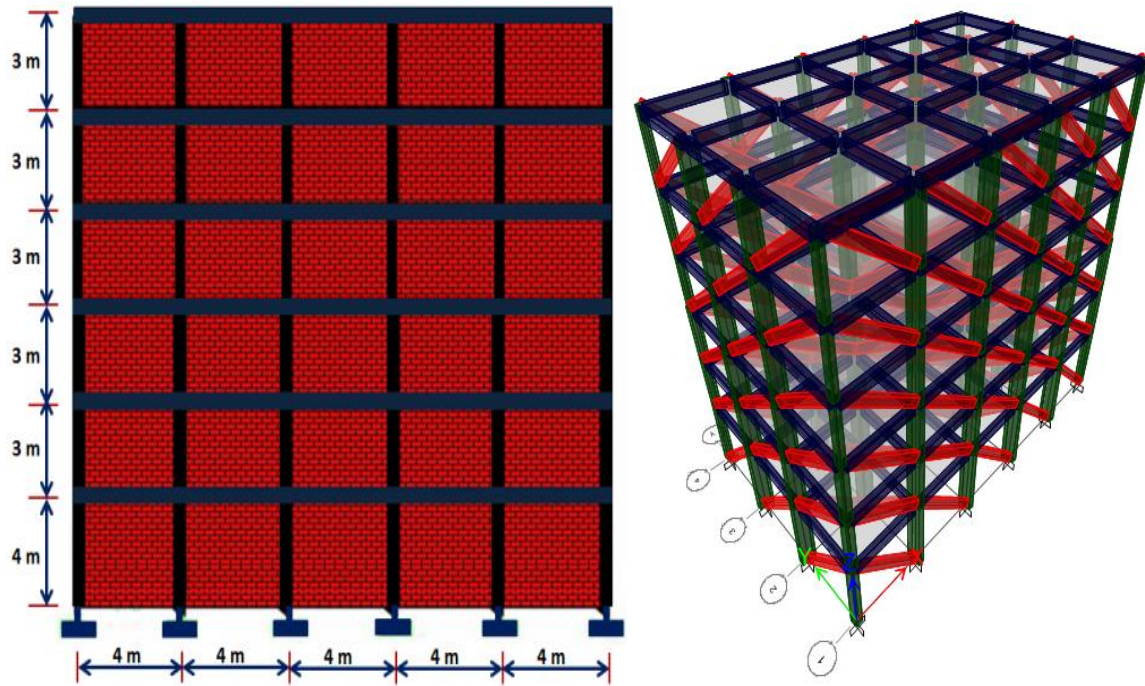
Schematic representation of typical front view and 3-D view of the fully masonry infill frame building model for the 6-story residential building
